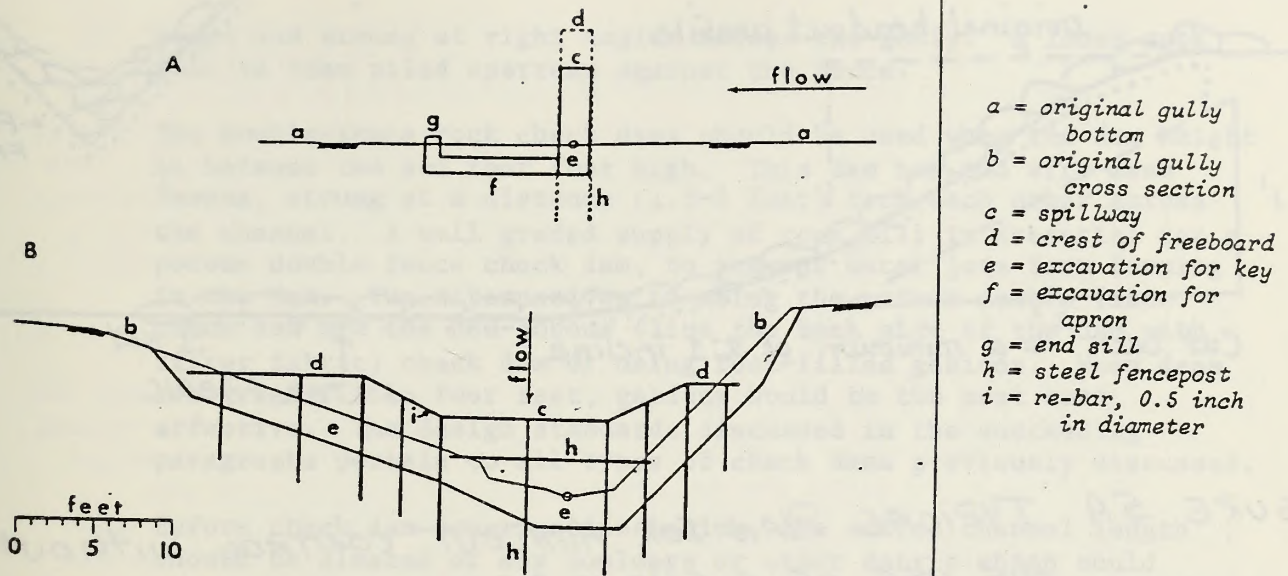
A.\* TYPICAL CONSTRUCTION PLANS FOR A DOUBLE-FENCE ROCK CHECK DAM
